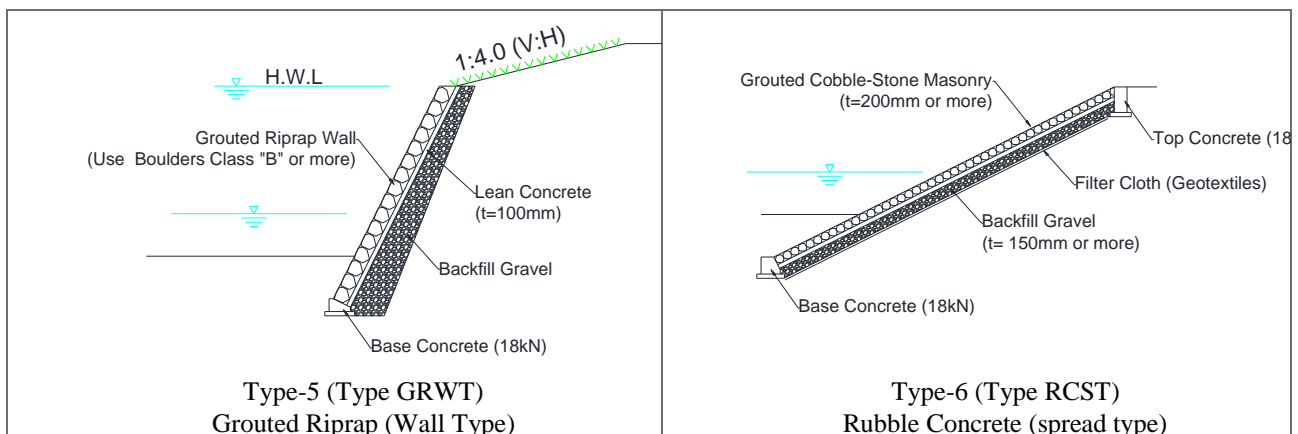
Standard Types of Revetment (Slope Protection) to be adopted in Common Conditions
